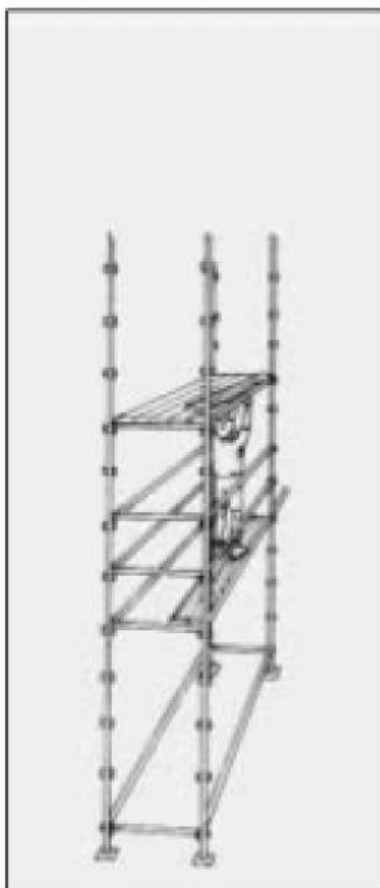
Work from a platform at least 450mm wide to install planks overhead. Platform does not need to be installed on the bottom level of the scaffolding
